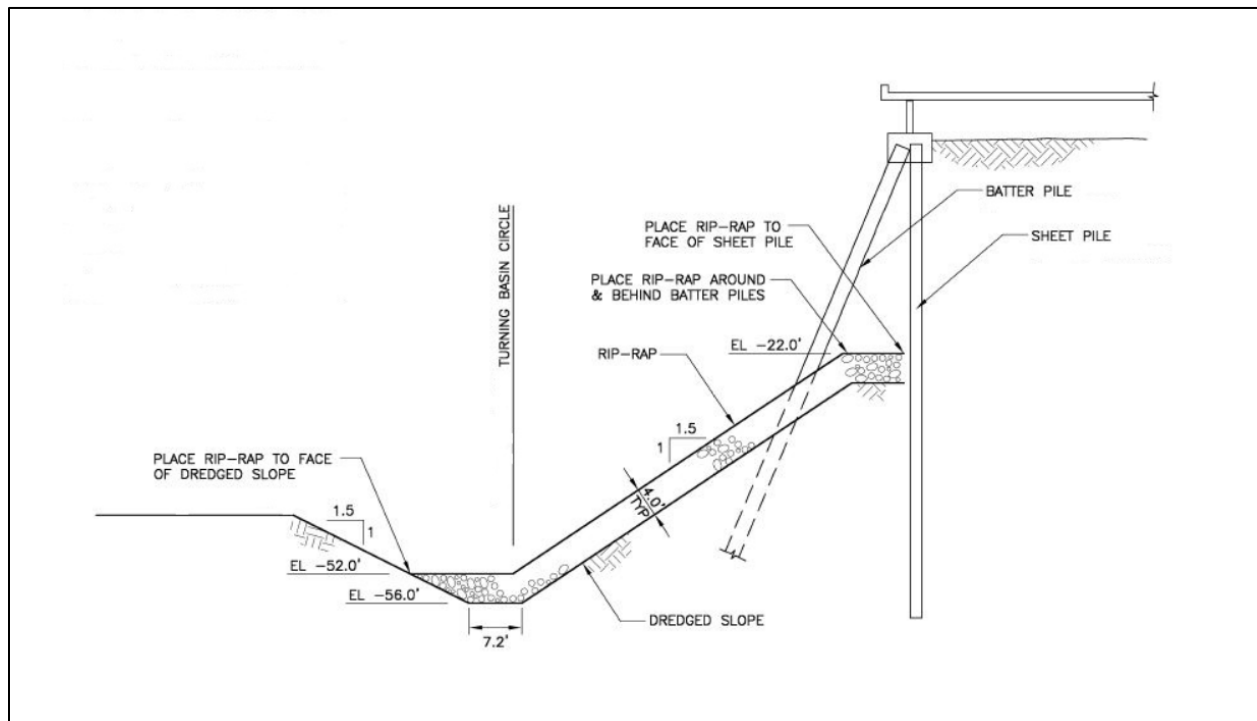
Preliminary Bulkhead Wall Cross-Section
